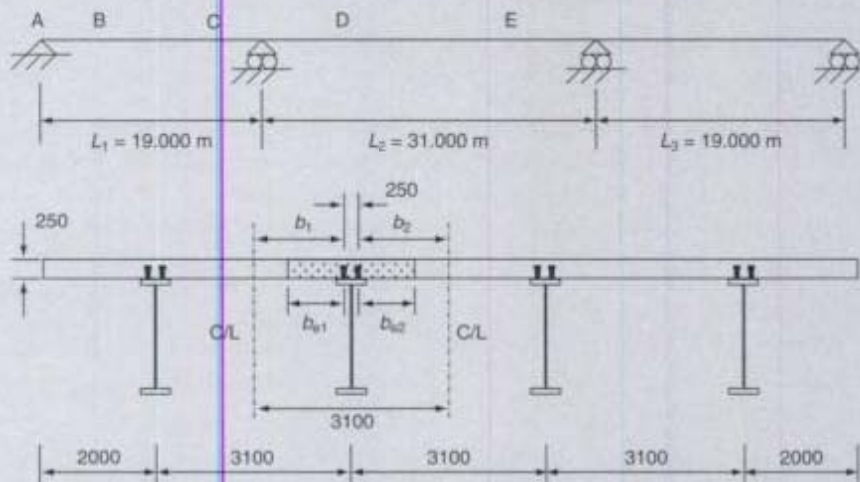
Elevation and typical cross-section of bridge for Example 5.1
